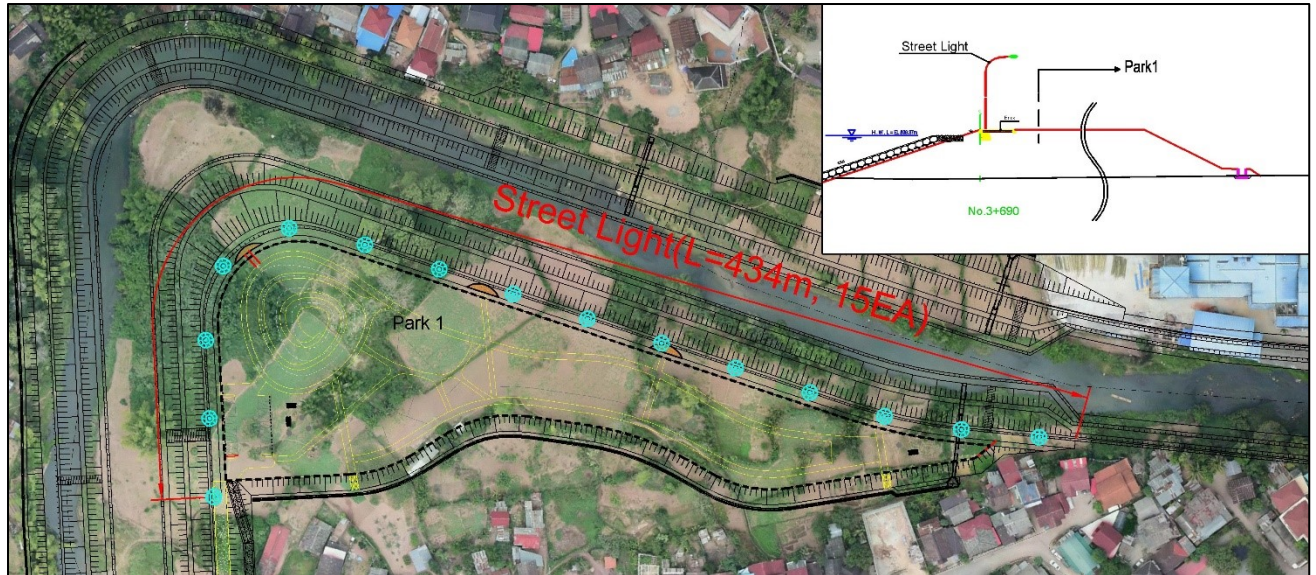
Location of the Proposed Street Light along the Riverside Park 1
